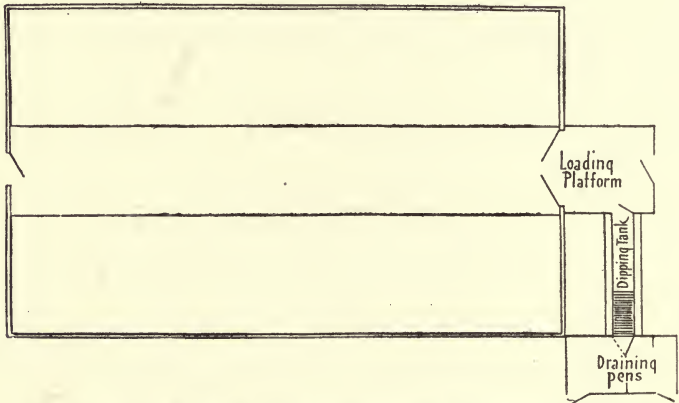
GROUND PLAN OF DIPPING PLANT AT WAUKESHA, WIS.
